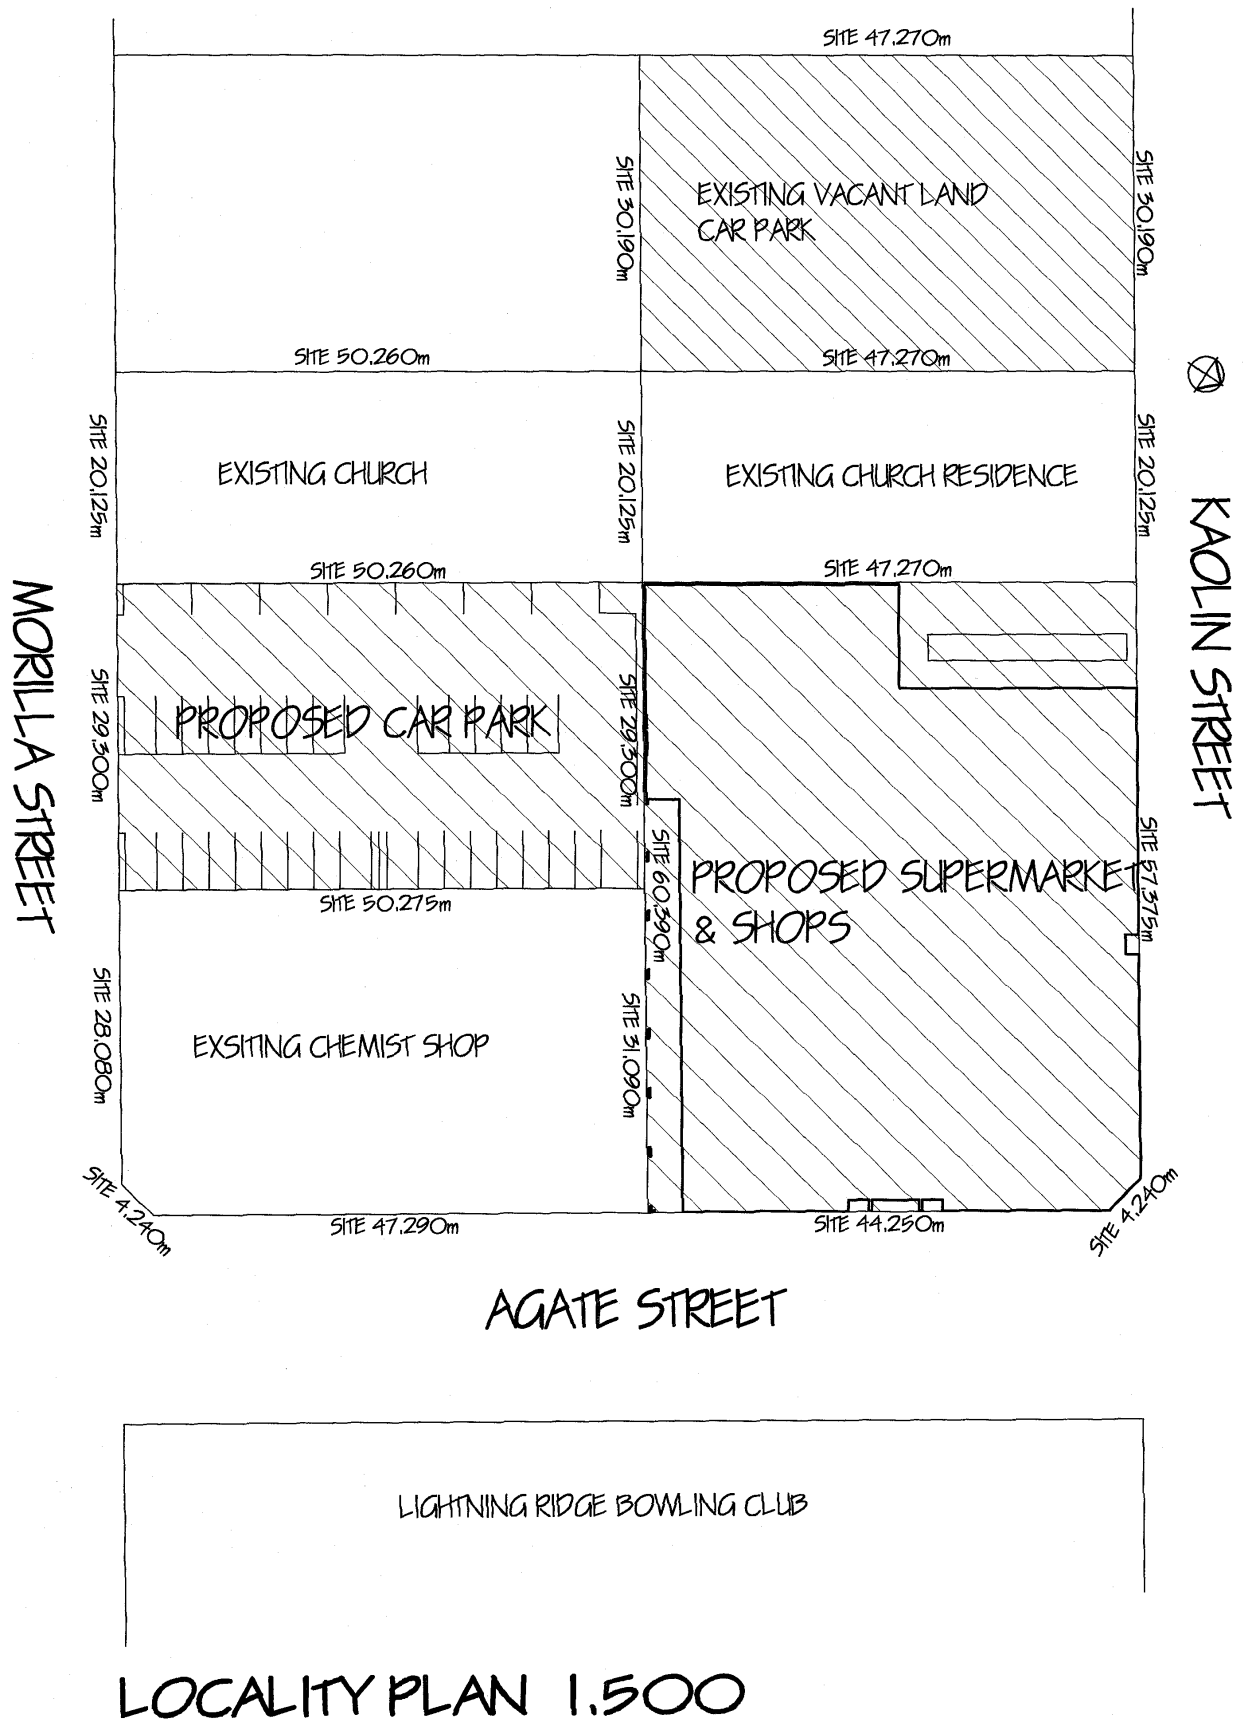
SITE PLAN AND SHADOW DIAGRAM
